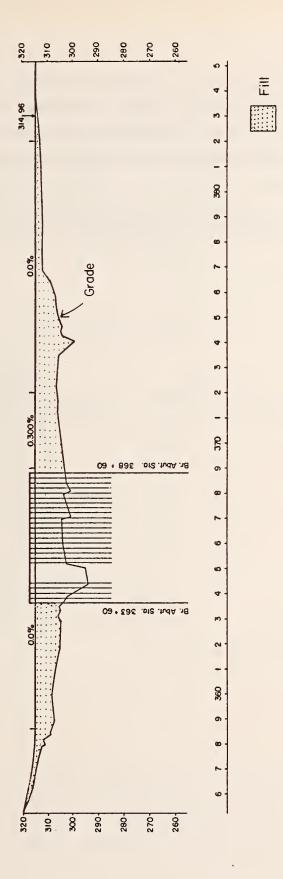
Cross-Section of Bridge Site at Tallahalla Creek, Mississippi
